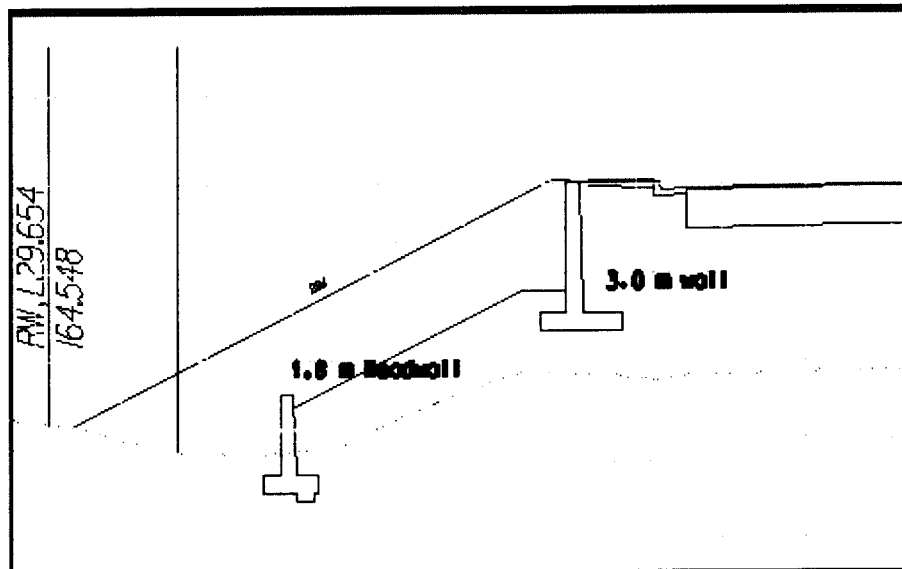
Retaining Walls Section View SVR Line (Sta. 99+00)
